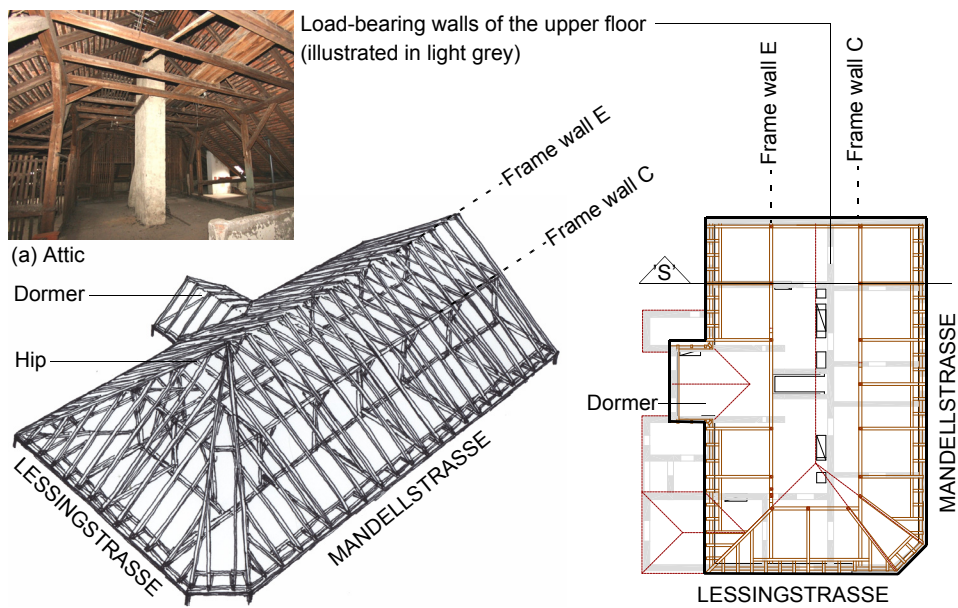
Left: Perspective of the spatial structure (without chimneys), Right: Floor plan.
